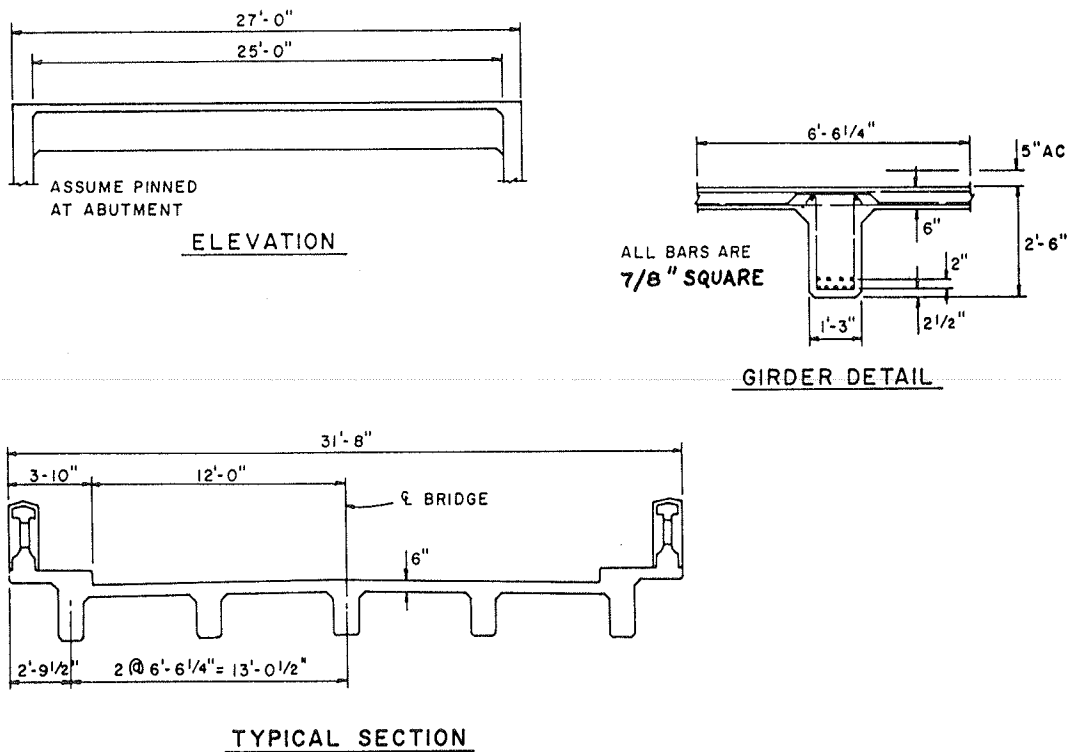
Single-span, T-beam bridge evaluated in example.
